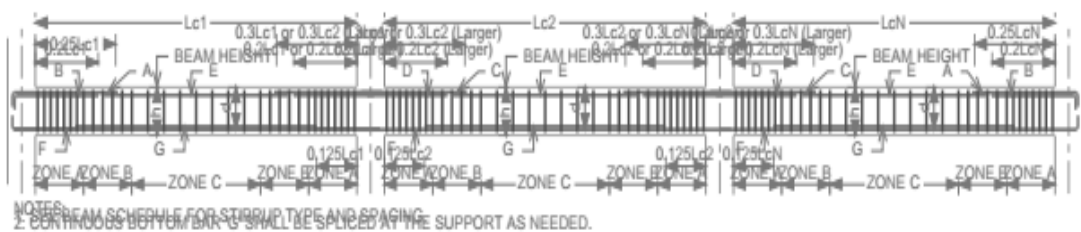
Longitudinal section reinforcement section for typical beam beneath the two adjacent slabs
